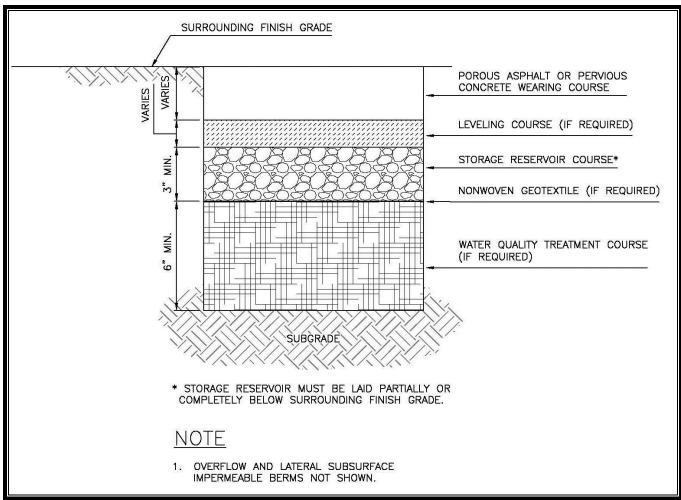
Porous Asphalt or Pervious Concrete Section
